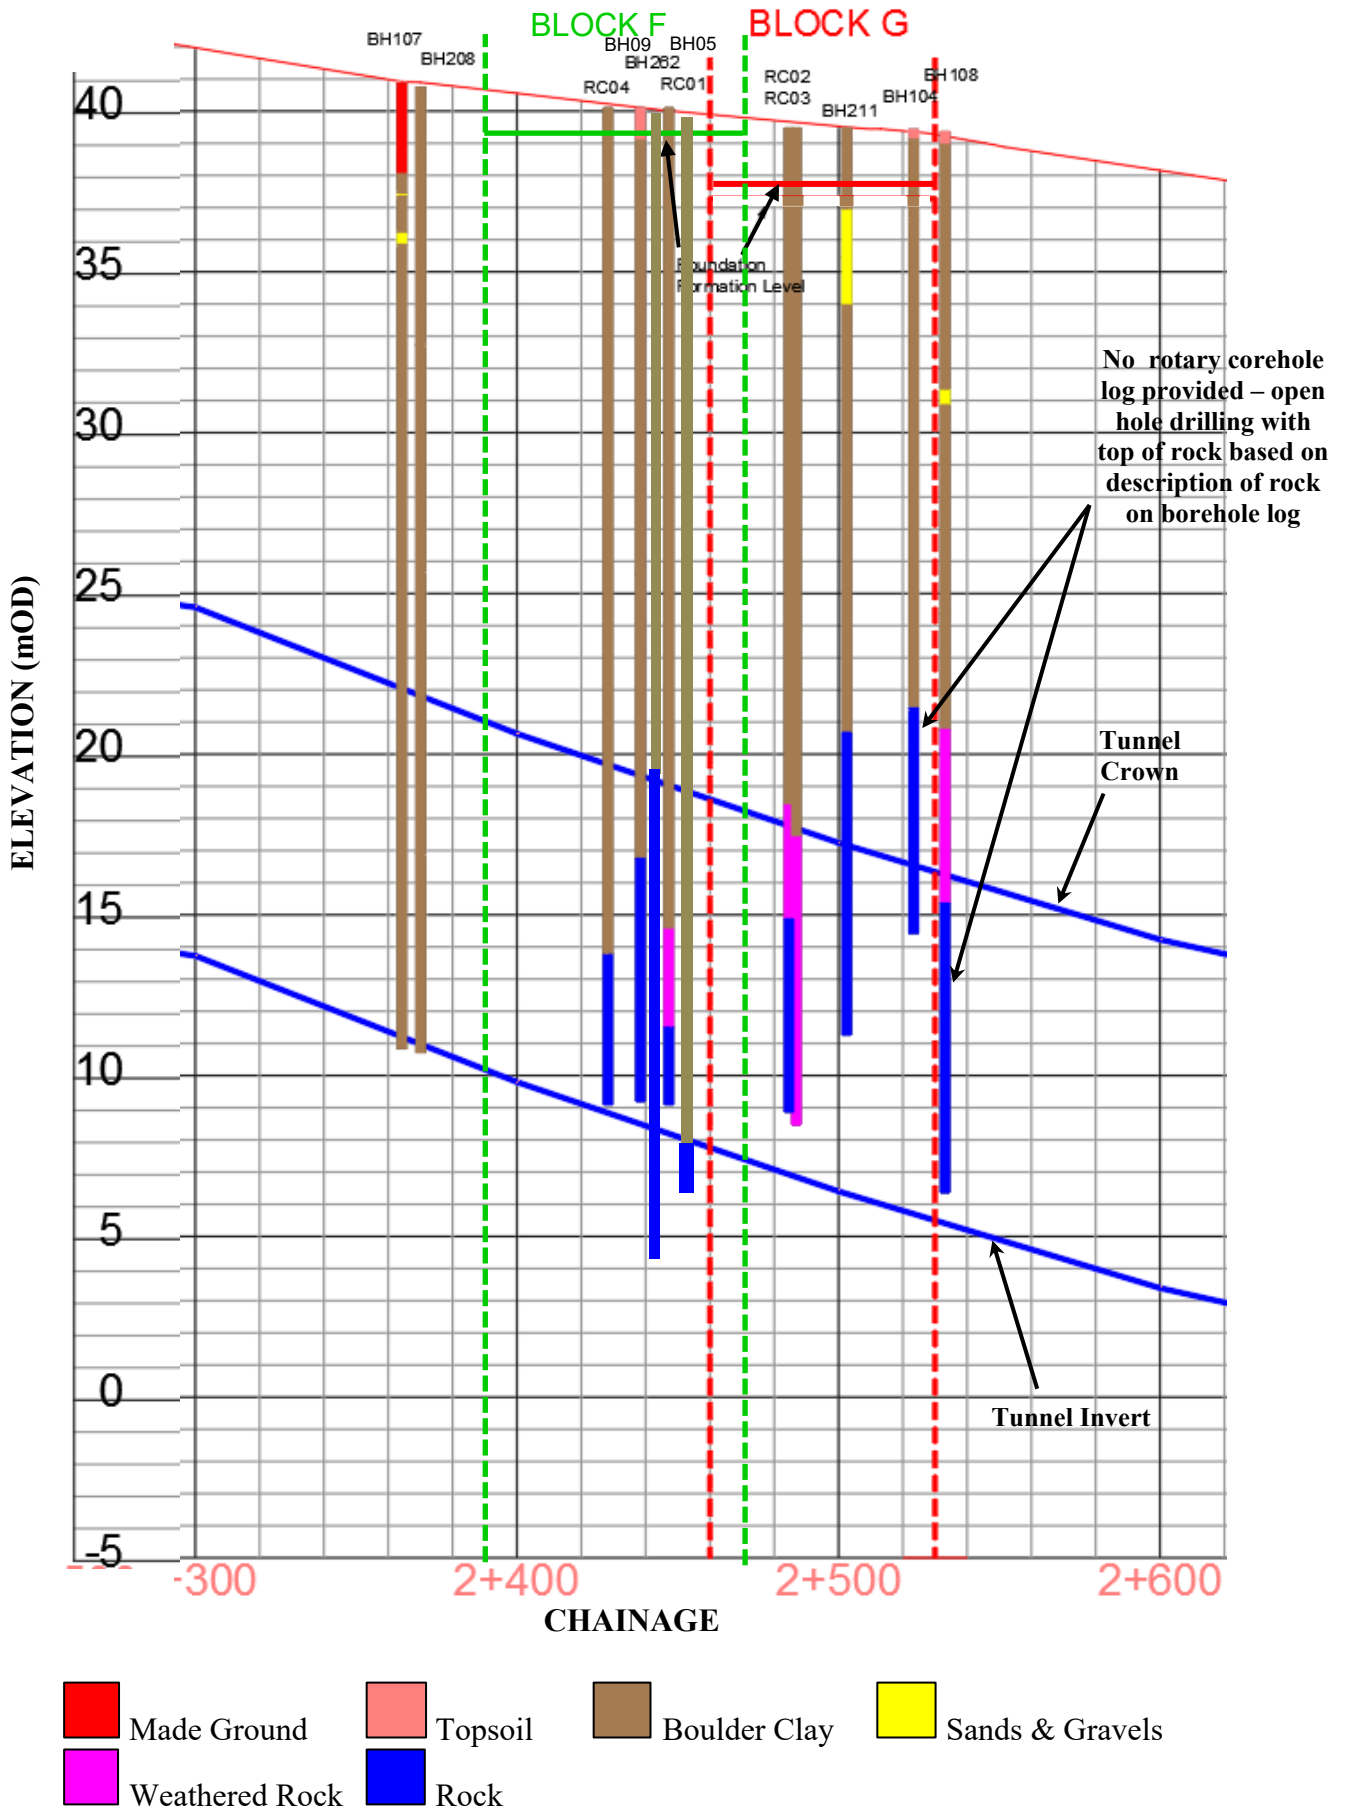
Subsurface ground profile along northbound tunnel within site
